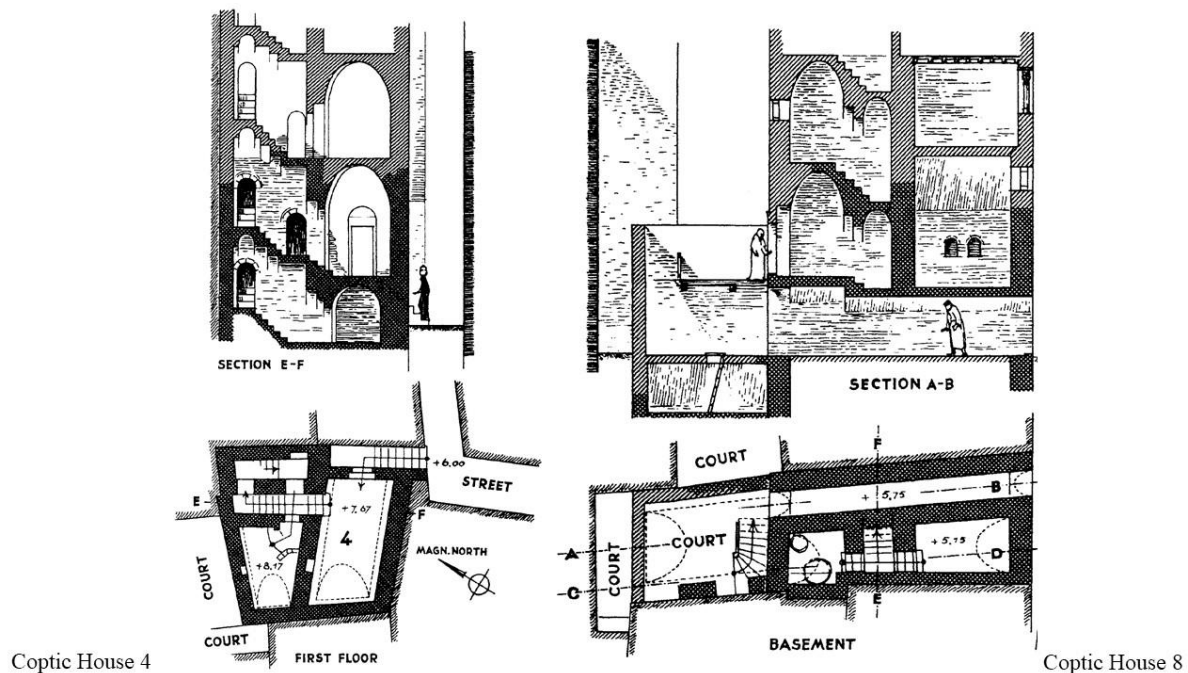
Plans and elevations of Coptic house 4 (to the left) and Coptic house 8 (to the right) at Djeme (after Hölscher 1954, plate 41).
